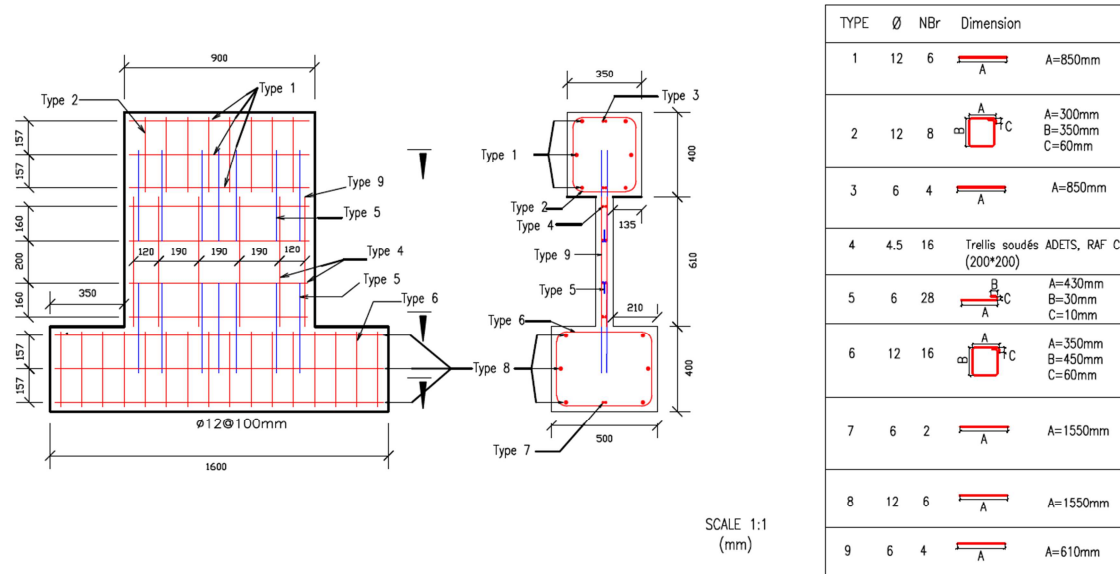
Reinforcement of the short walls (VC1 and VCR1)
